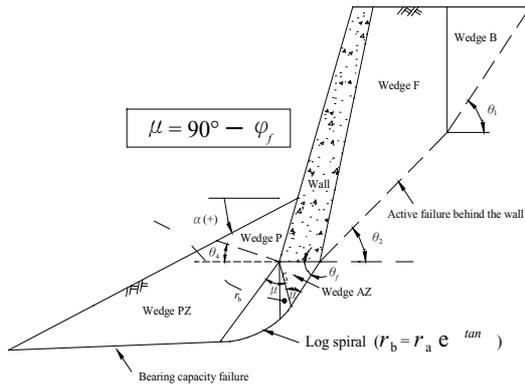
Observed failure mechanisms of soil retaining wall situated on slope.
